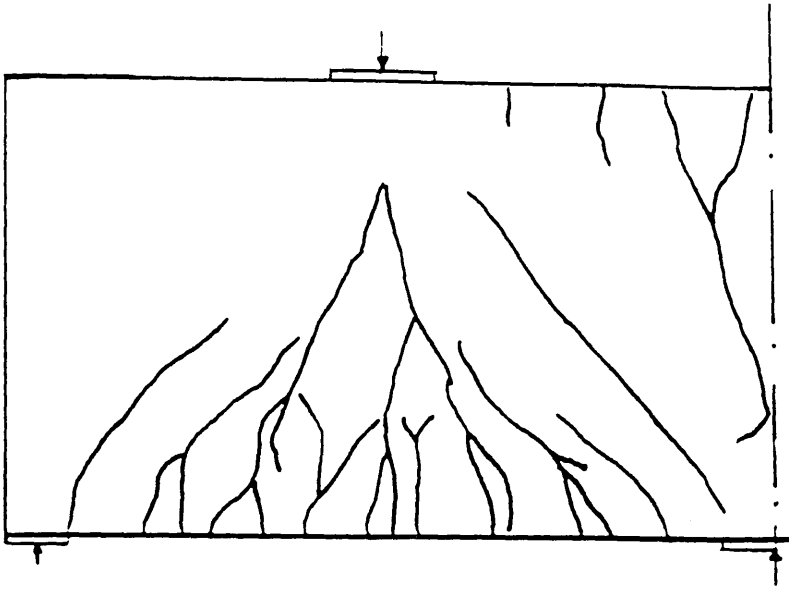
Predicted crack pattern and deformed shape at 600kN (TRGRASS)
